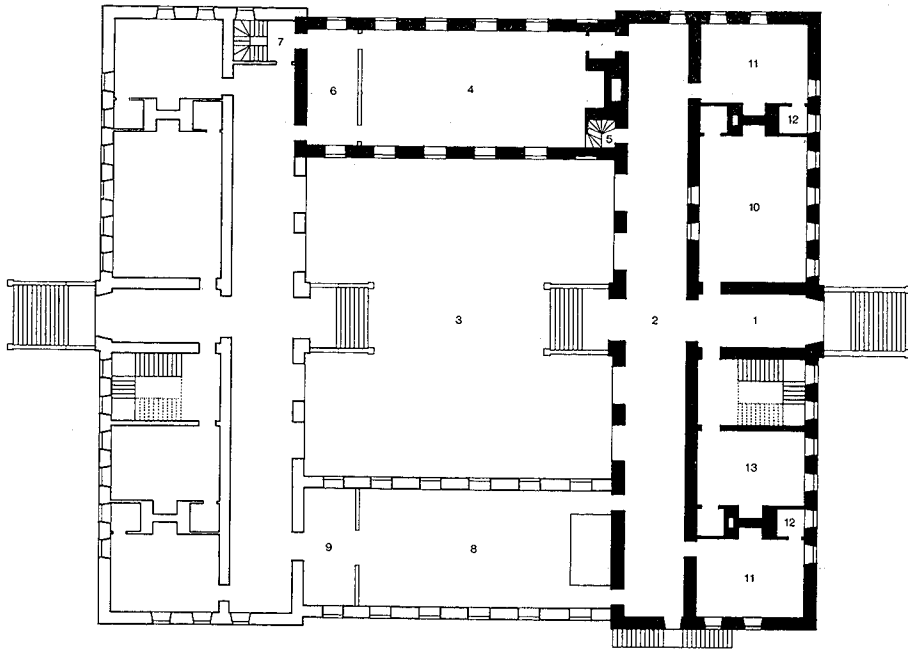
William S. Pavlovsky, *Conjectural Plan, The College of William and Mary (first building, 1695–1699)*, drawing, 1988.
